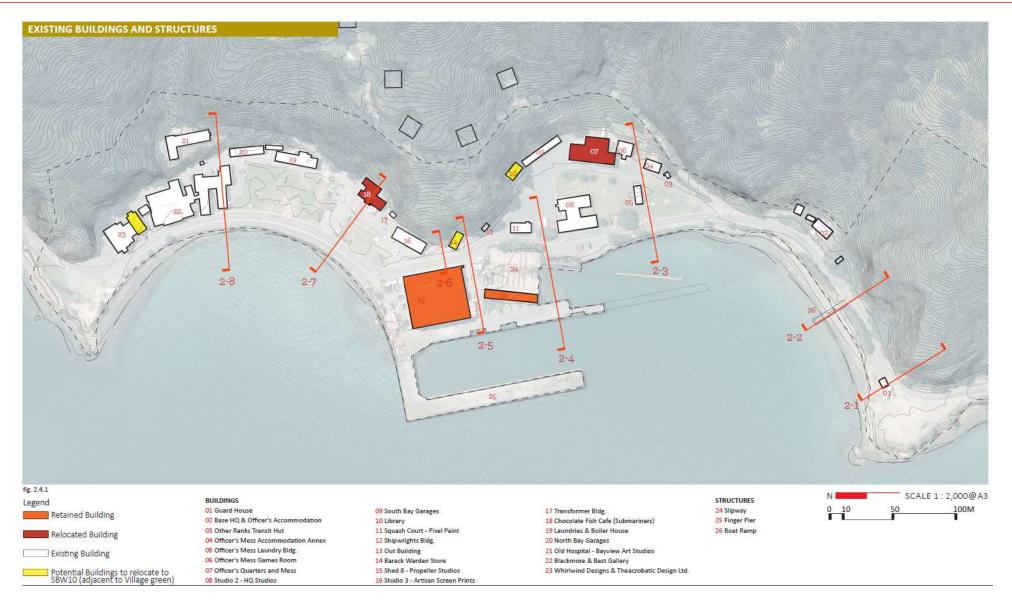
Existing buildings and structures at Shelly Bay as identified in the 2019 Masterplan (p9)
